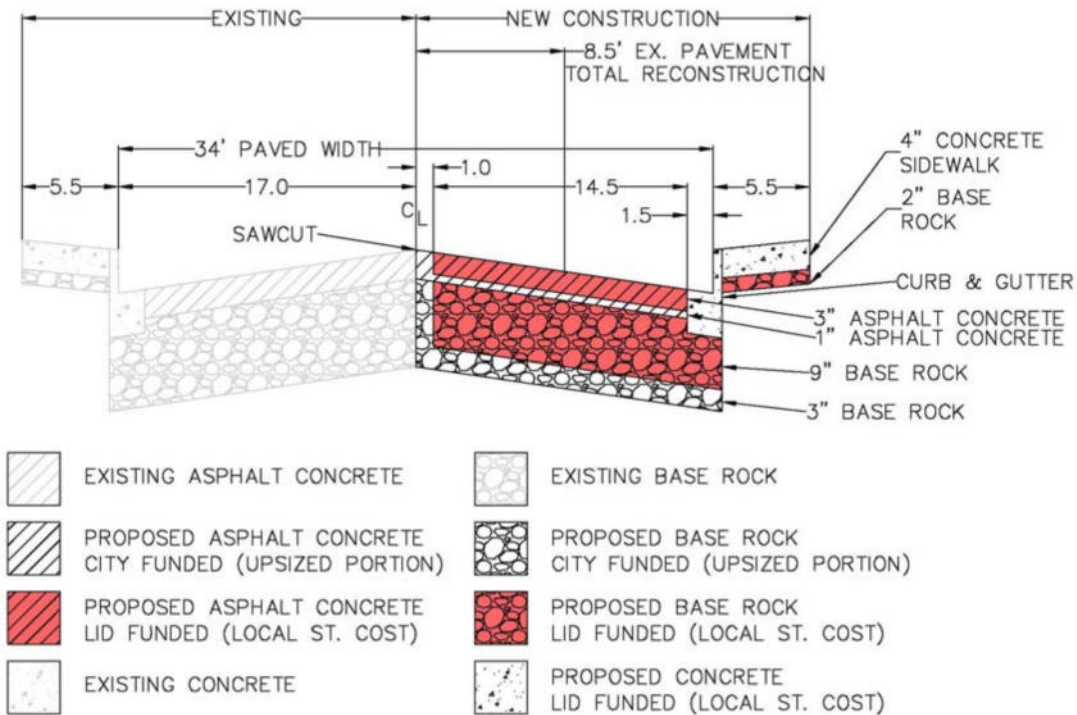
GROUP B CROSS SECTION 2 (NORTH IS LEFT)
